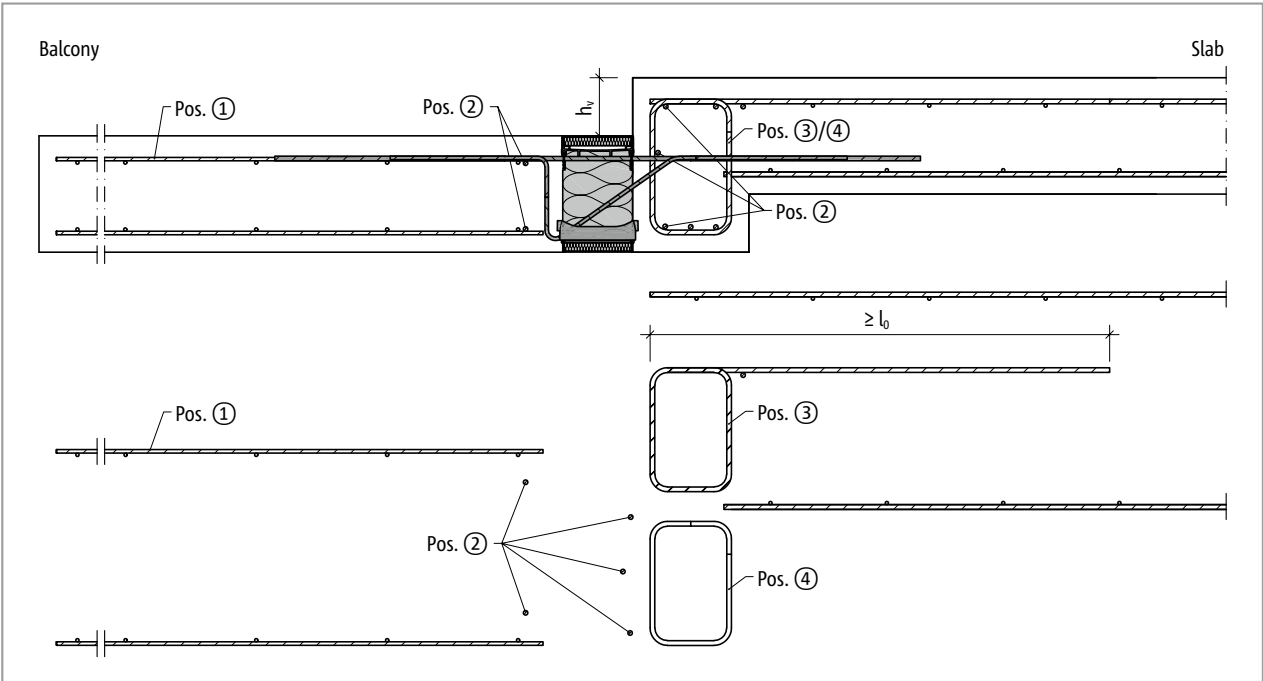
Schöck Isokorb® XT type K: On-site reinforcement for small height offset
